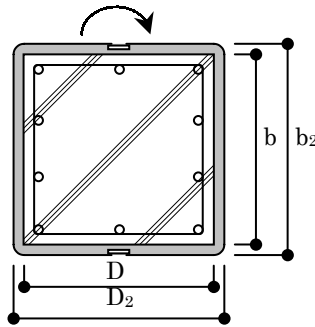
Cross section of jacketed column with steel plate
